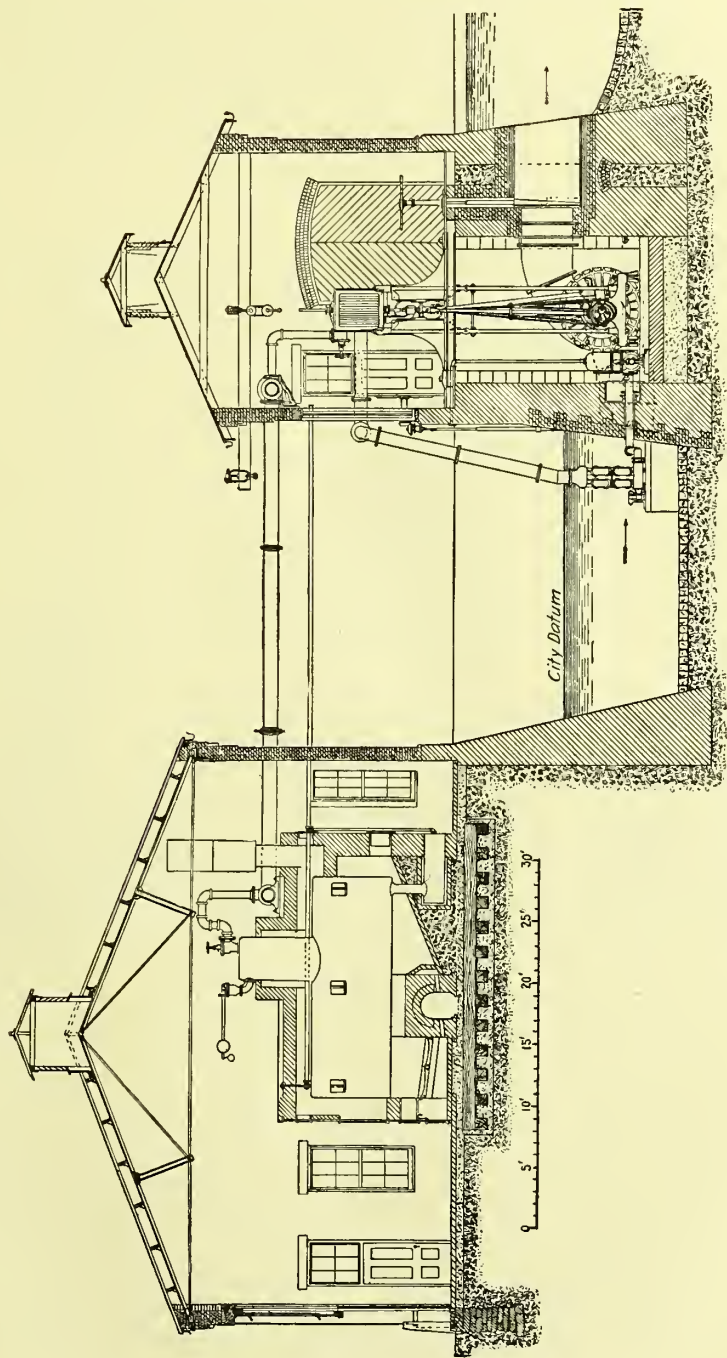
CROSS-SECTION OF BRIDGEPORT PUMPING STATION.
